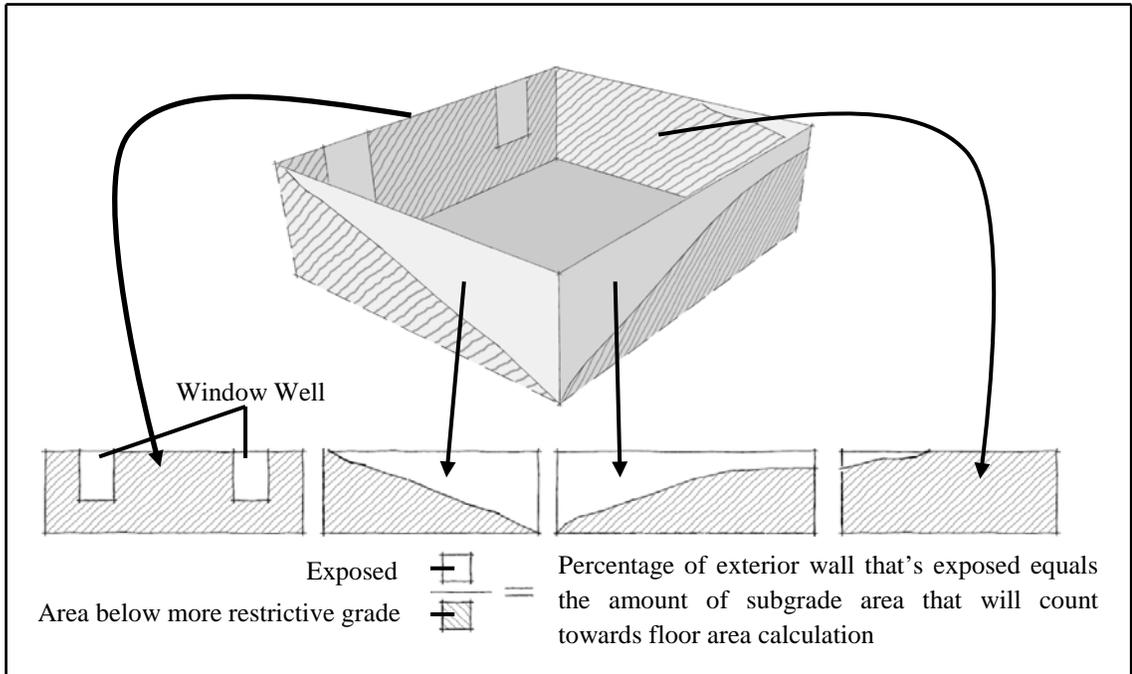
Determining the amount of a subgrade floor to be counted as Floor Area
